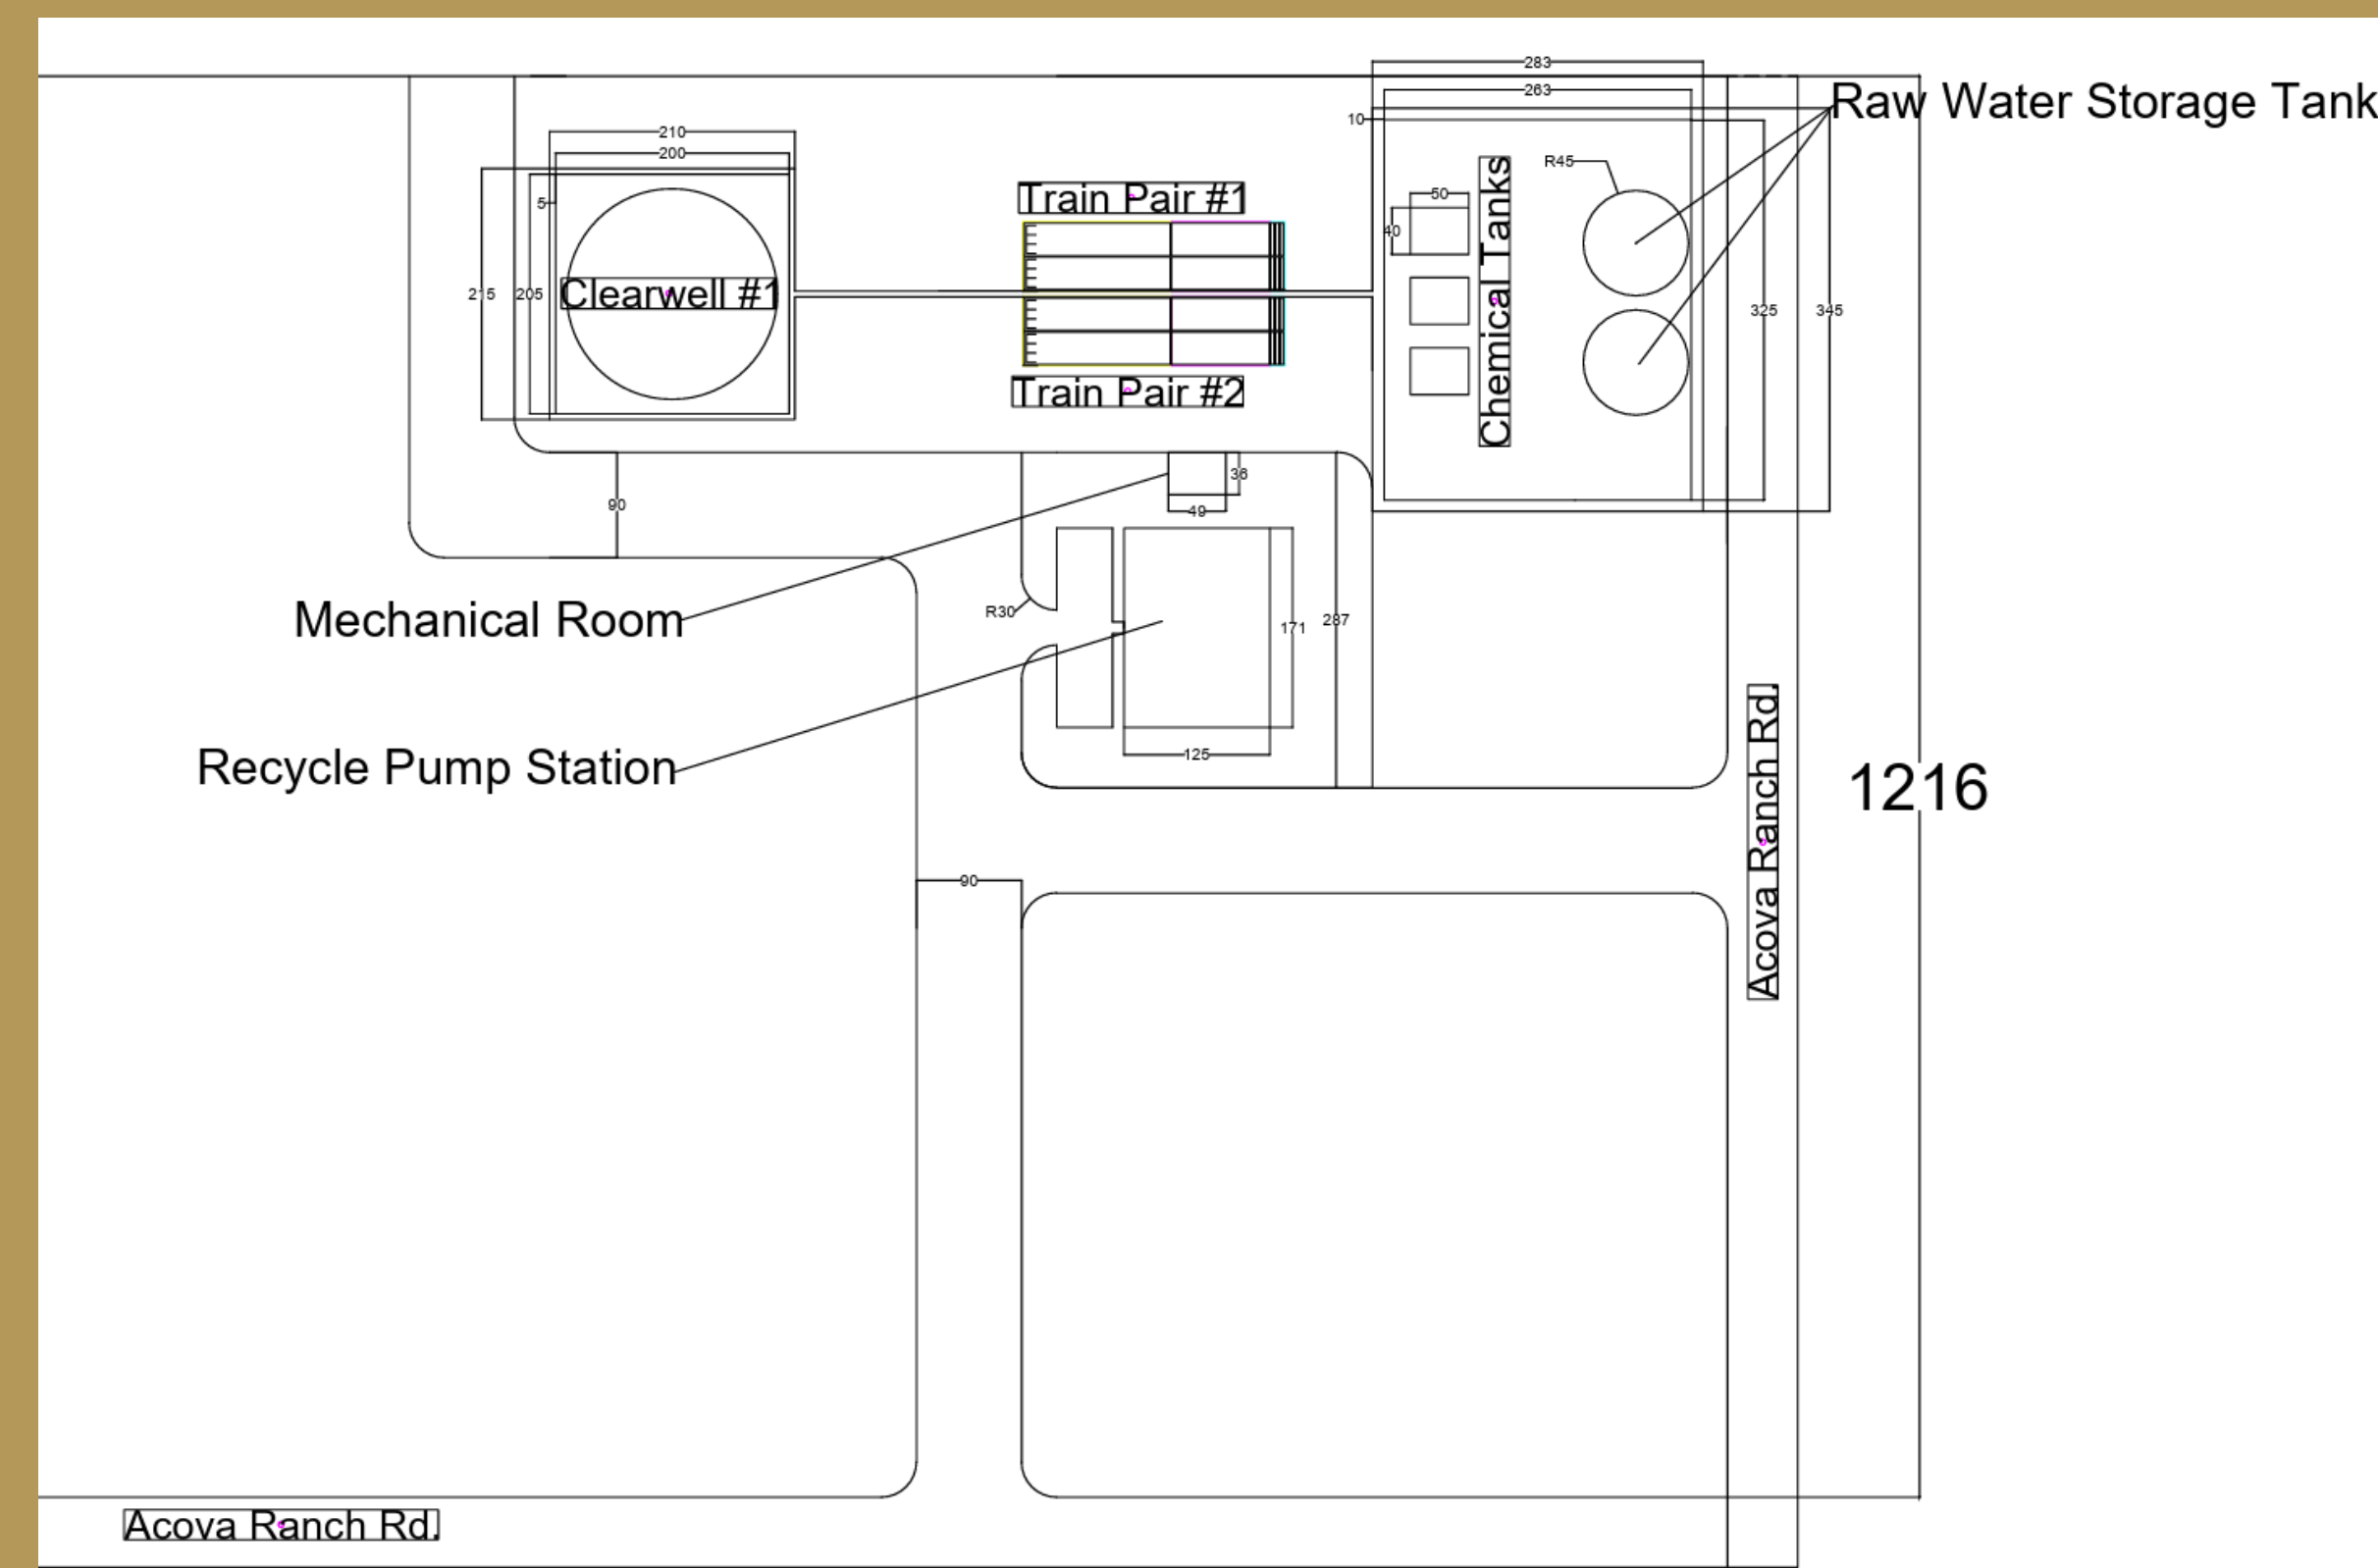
Initial draft of treatment plant layout prior to Design Elements 2 & 3
